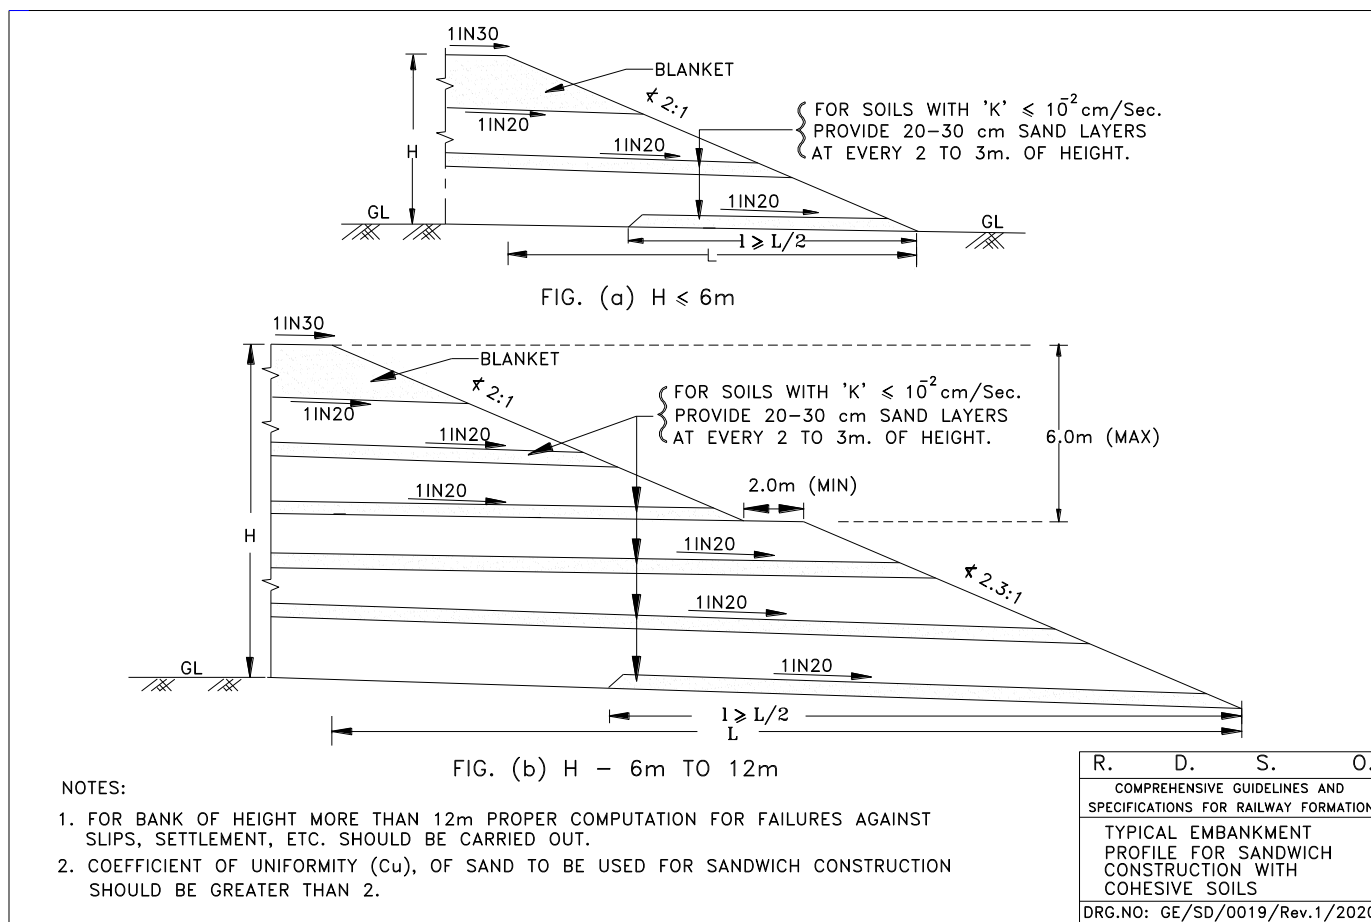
Typical embankment profile for sandwich construction with cohesive soil
